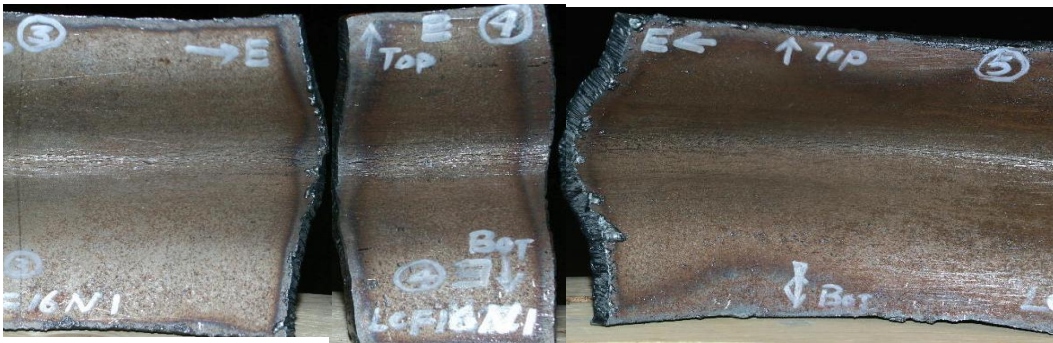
Cracks on the lower wrinkle foot and dimple formed on wrinkle crest (specimen LCF16N1)
